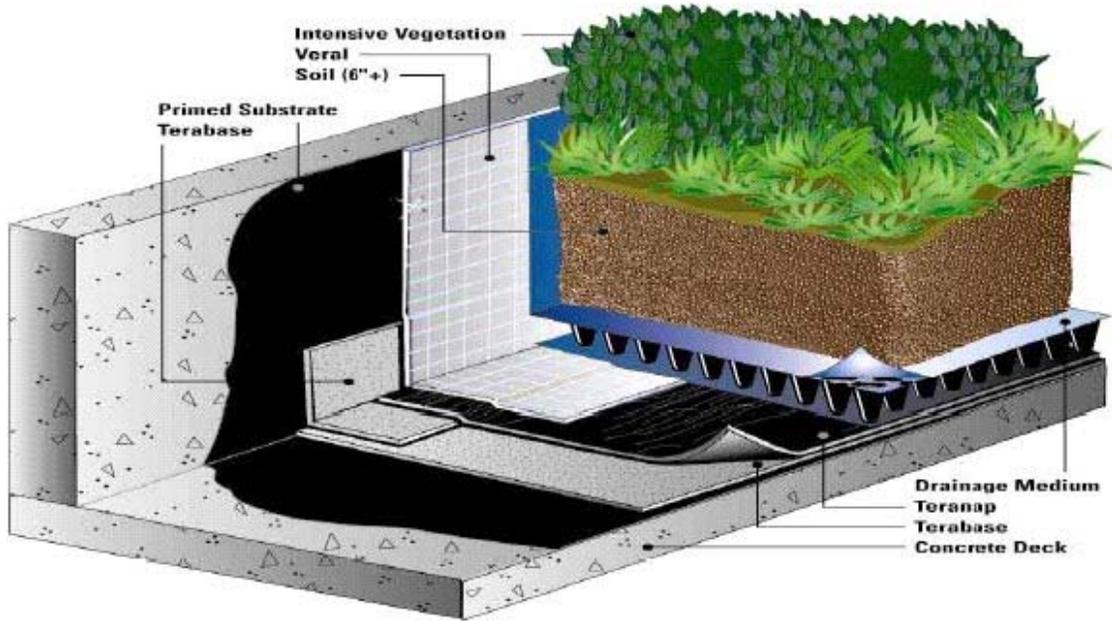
Green roof cross-section (Source: www.cif.org)
